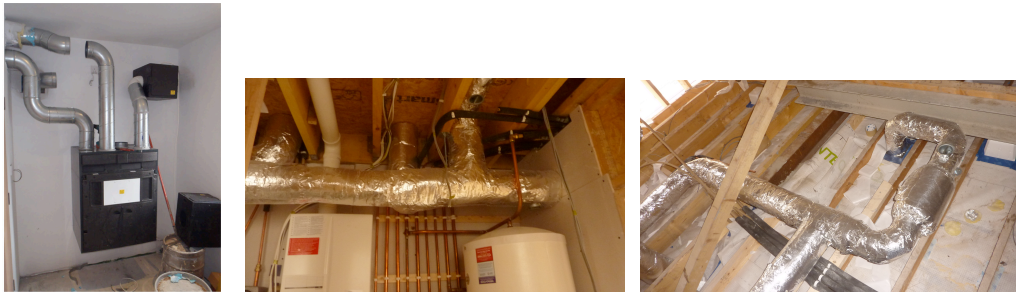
,17,18 photo of installation of ductwork and MVHR unit before completion, and insulation of air heating supply duct after completion
